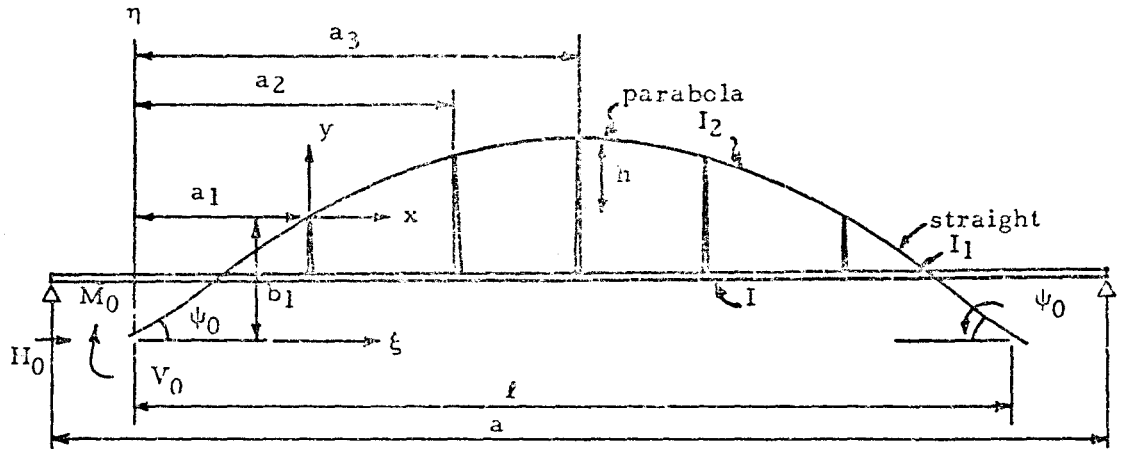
BRACED ARCH BRIDGE, ELEVATION VIEW
